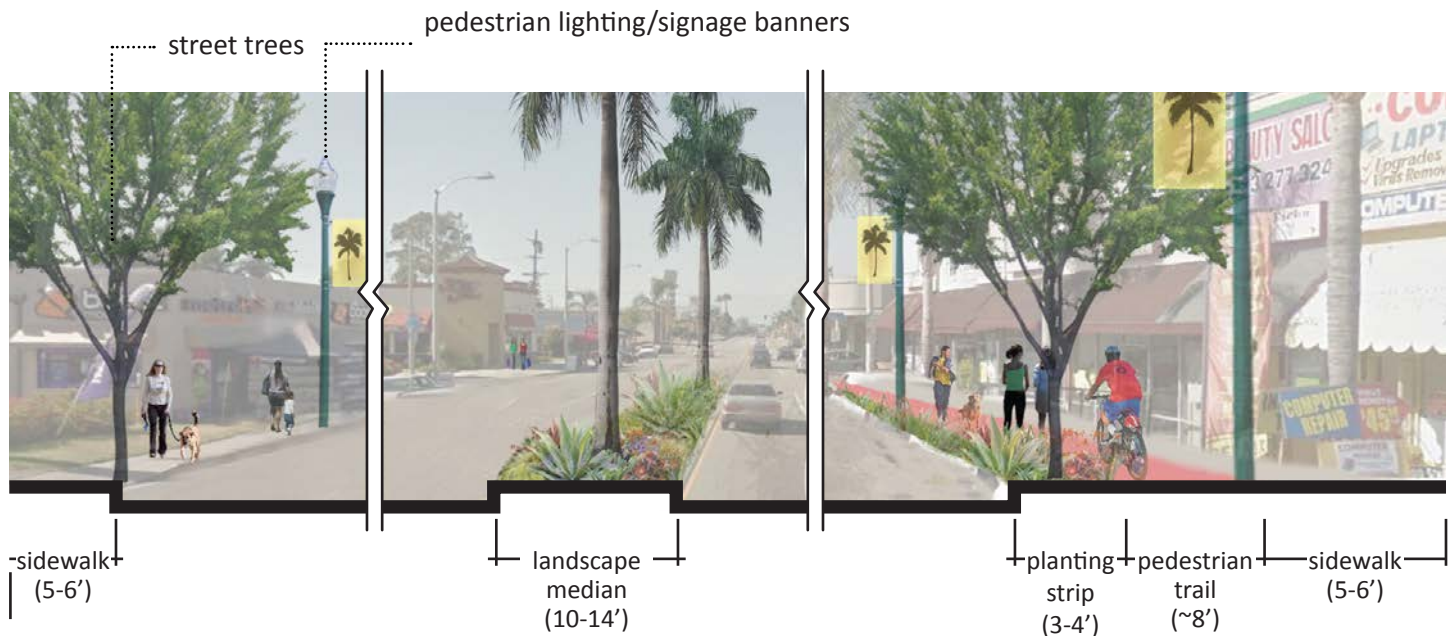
PACIFIC BOULEVARD STREETScape PROTOTYPICAL SECTIONS
